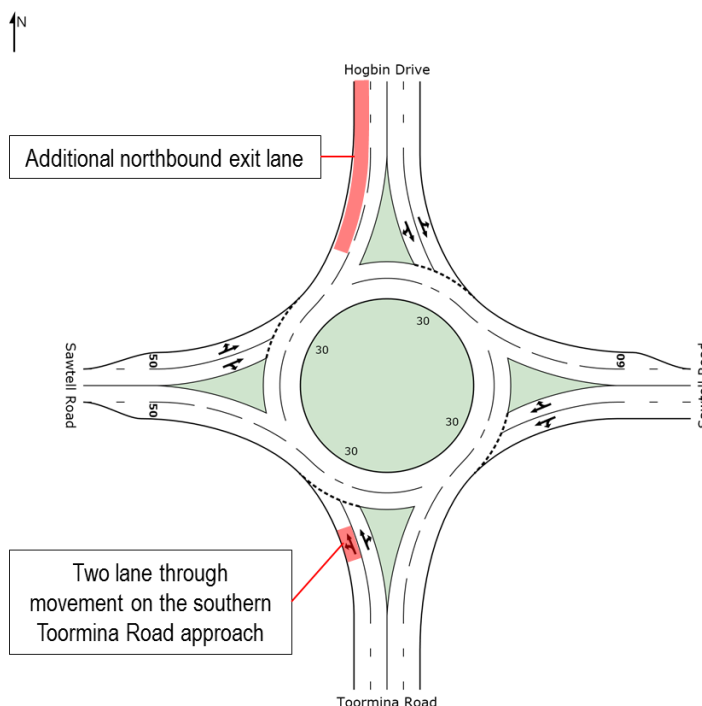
Site 1: Hogbin Drive / Sawtell Road / Toormina Road Upgraded Layout
